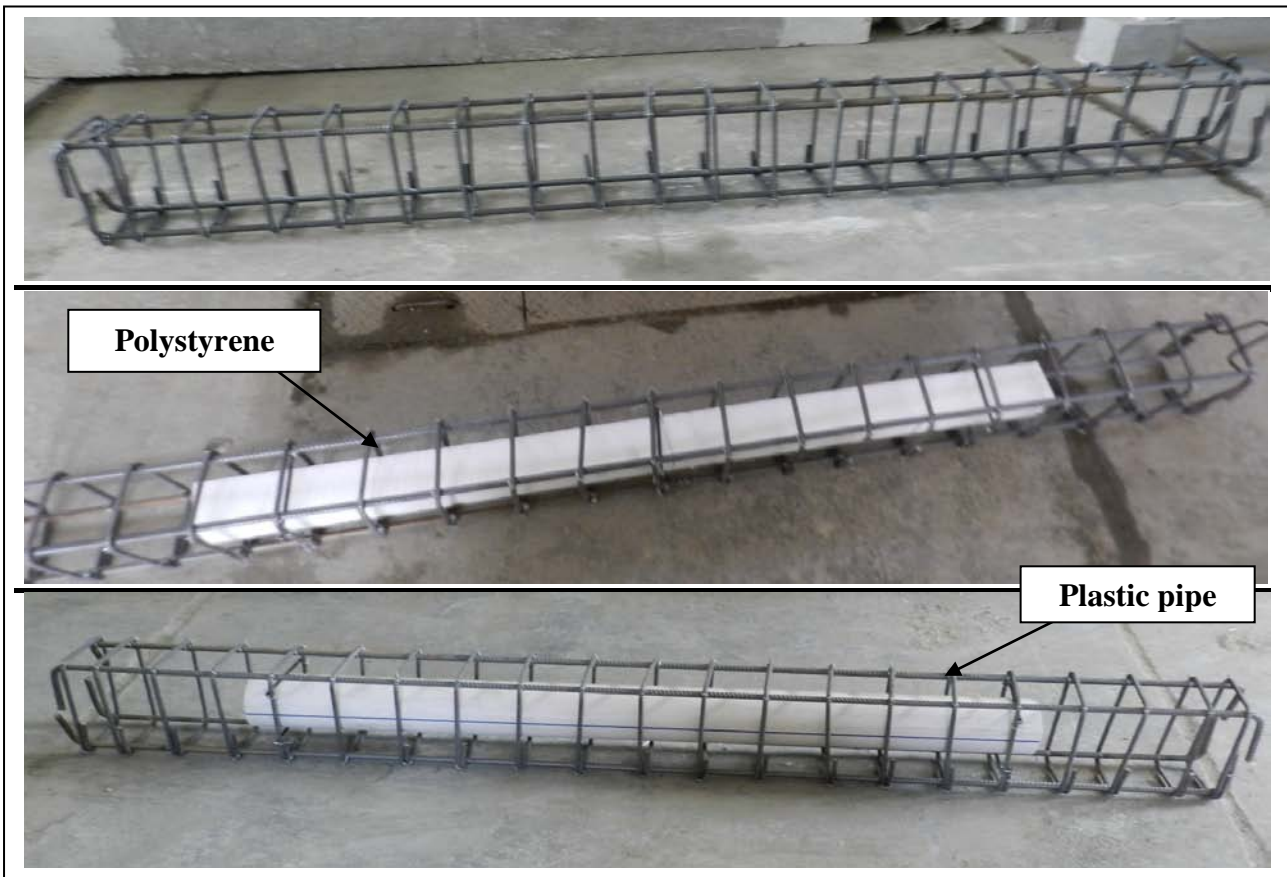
Arrangement of Steel Reinforcement, Polystyrene and Plastic pipe of Beam
